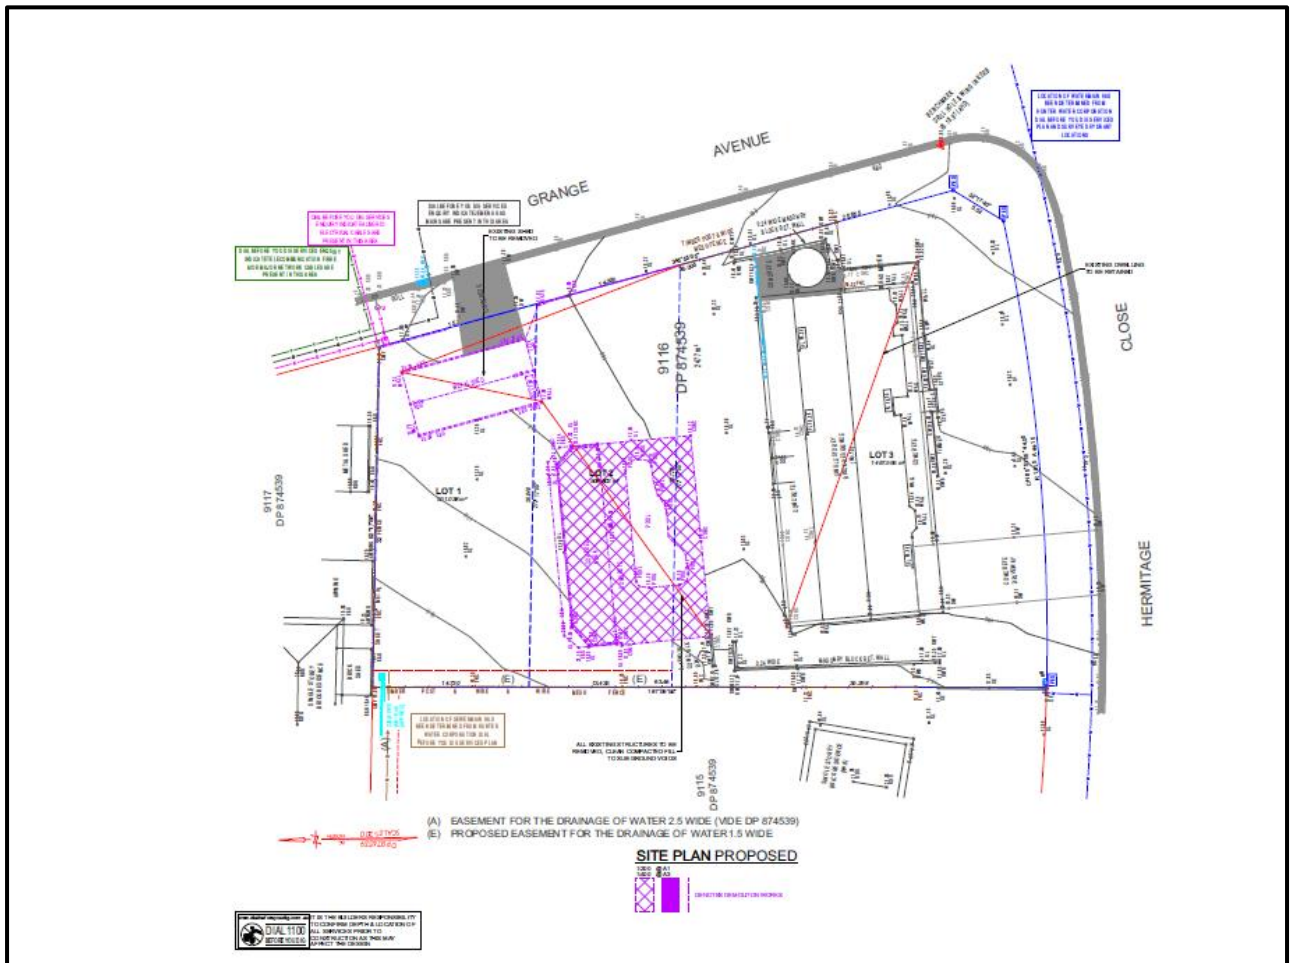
Proposed demolition plan in purple (Sorensen Design, 2022)
